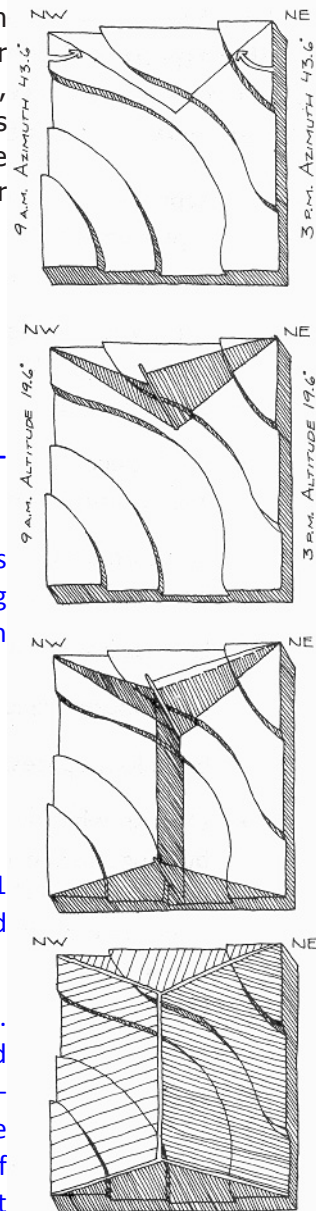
Typical Solar Envelope Construction. Top, down: Draw azimuths; construct altitude angle; construct north–south ridge; build roof planes.
